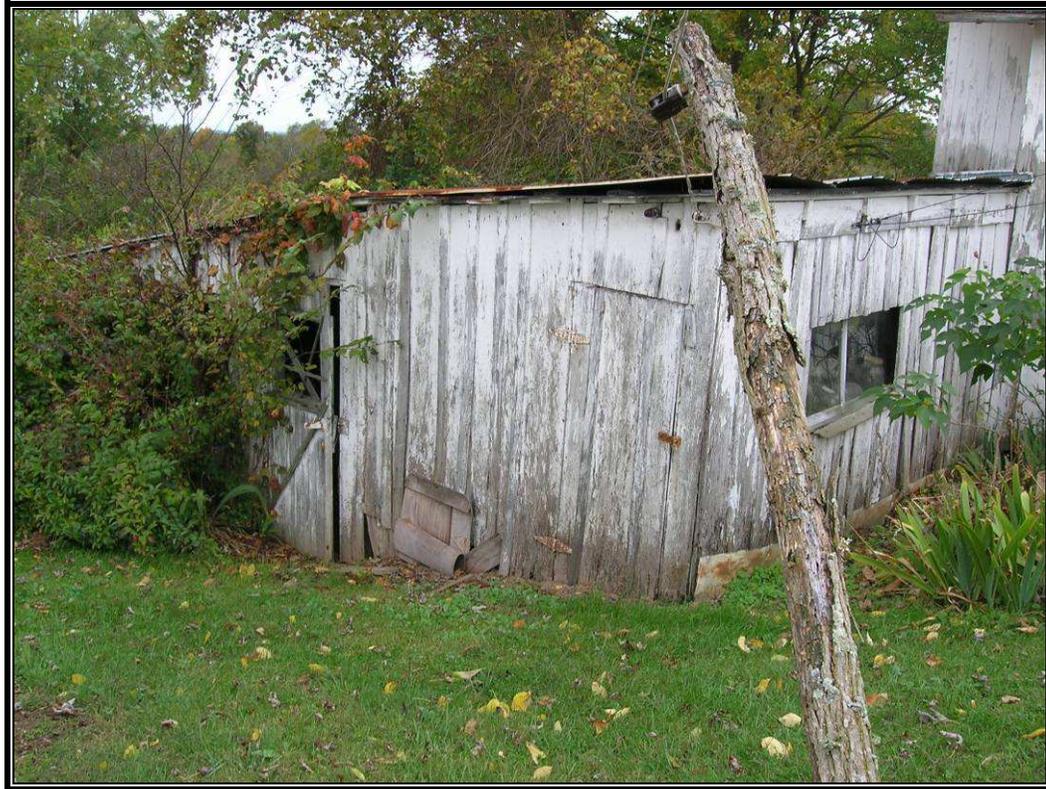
Site 141, Shed-roof addition attached to garage.
